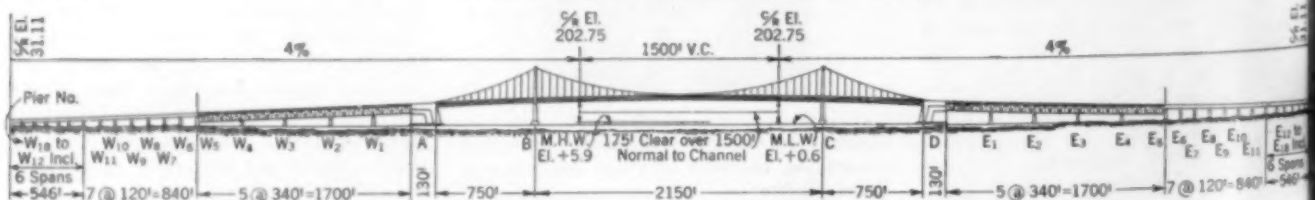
DELAWARE MEMORIAL BRIDGE (below) provides 2,000 ft of horizontal clearance between fender piles. Elevation of intersection of center line of cables and center line of tower is 442.17 ft. Elevation is drawn looking north.
